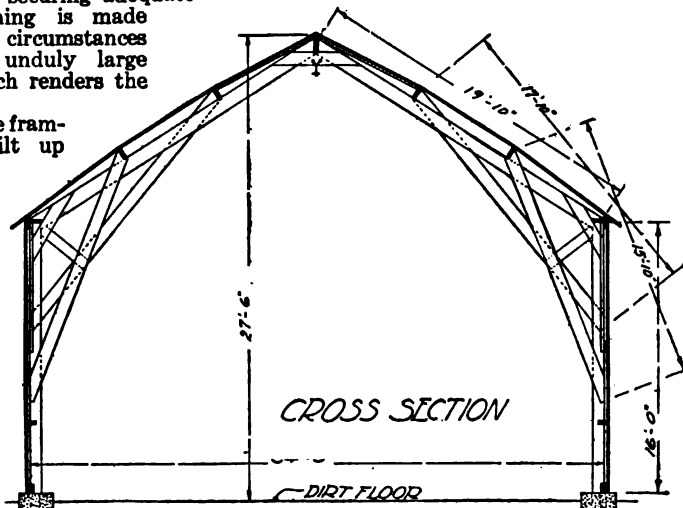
Section of a barn built on the straight-pitch, braced-truss principle solely for hay storage. In northern sections building material is saved and greater protection given to the stock by storing hay in the upper part of the horse and cattle barns.
